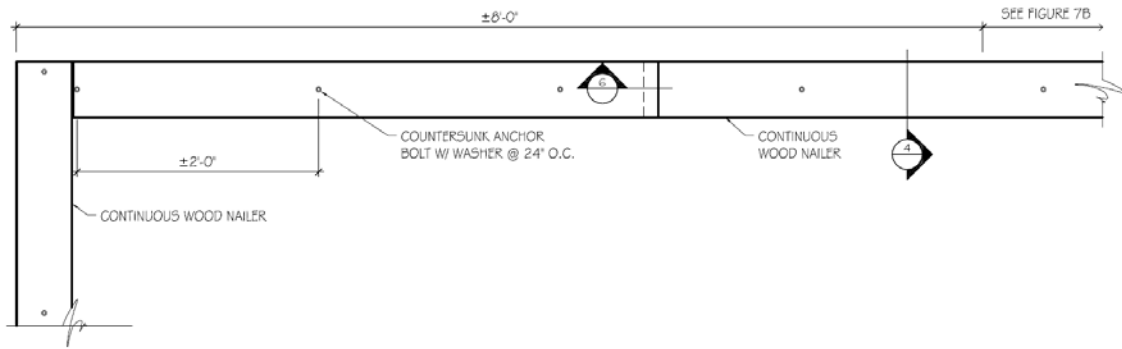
A - ROOF EDGE WOOD BLOCKING @ CORNER - THROUGH BOLT ANCHORAGE 8'-0" FROM CORNER
